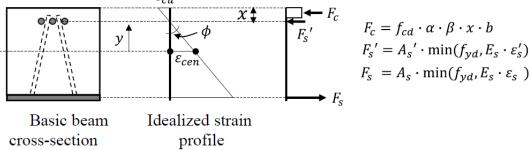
Beam cross-section ultimate strain and stress profiles
